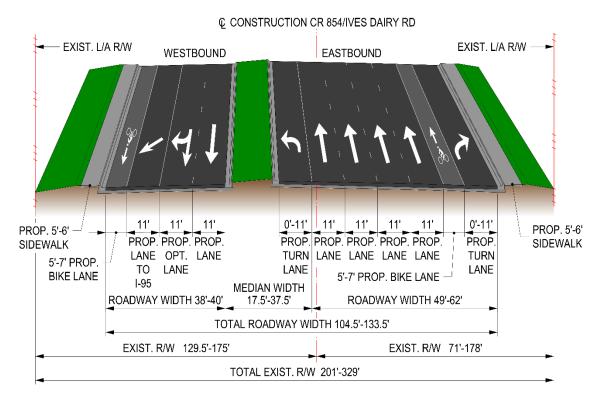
10: Proposed Typical Section - Alternative 2 – CR 854/Ives Dairy Road
